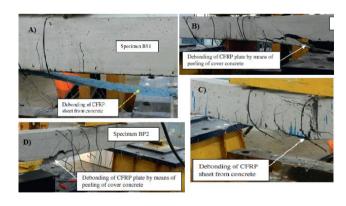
Debonding Failure in beam with A) CFRP Sheet subjected to Static Loading B) CFRP Plate subjected to Static Loading C) CFRP Sheet subjected to Cyclic Loading D) CFRP Plate subjected to Cyclic Loading [10]
